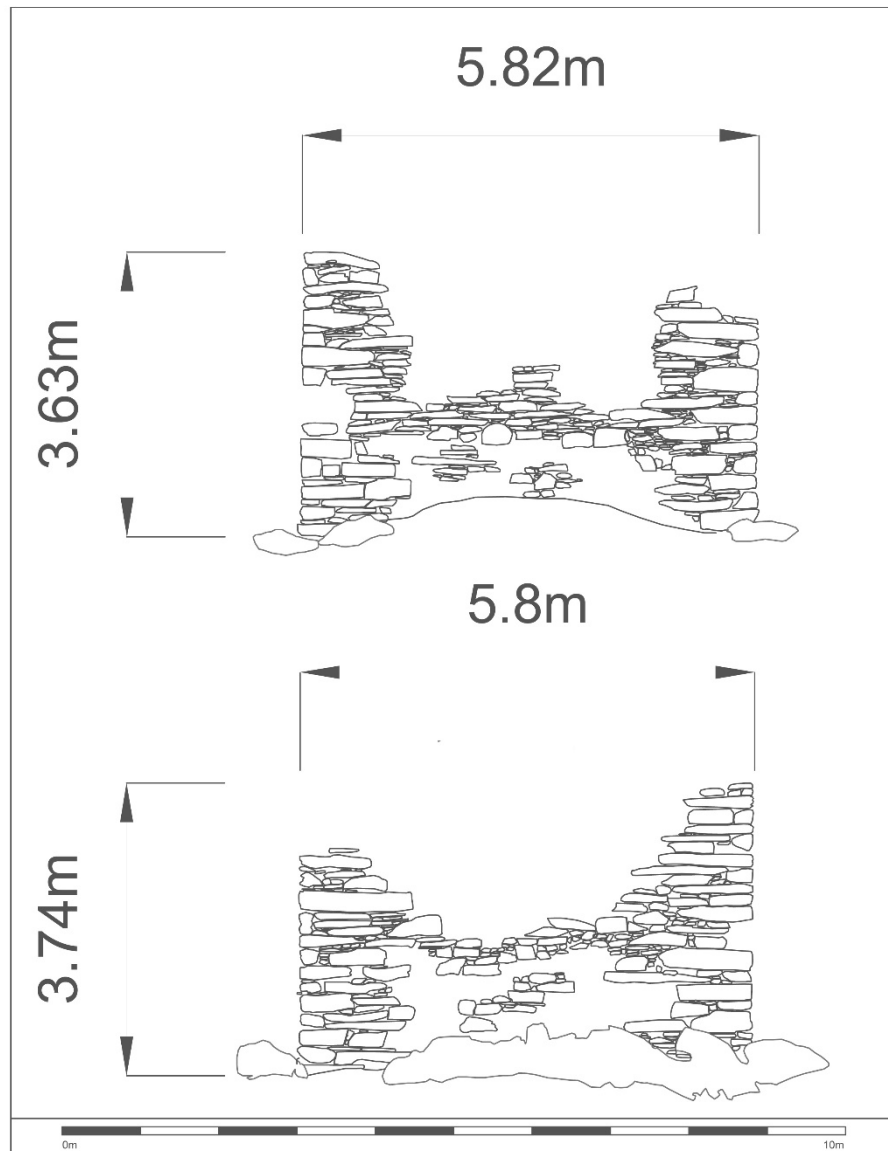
External elevations of north (top) and west (bottom) walls of Inishturk Signal Tower.
